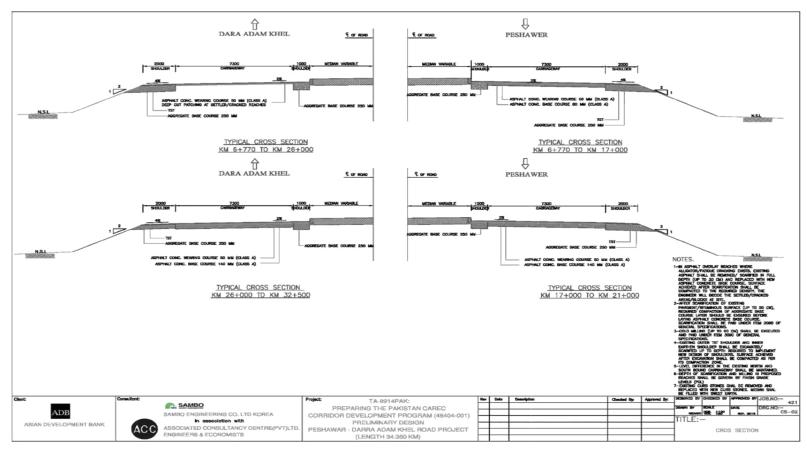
Typical Cross-section of the Road between km 21+000 to 26+000
